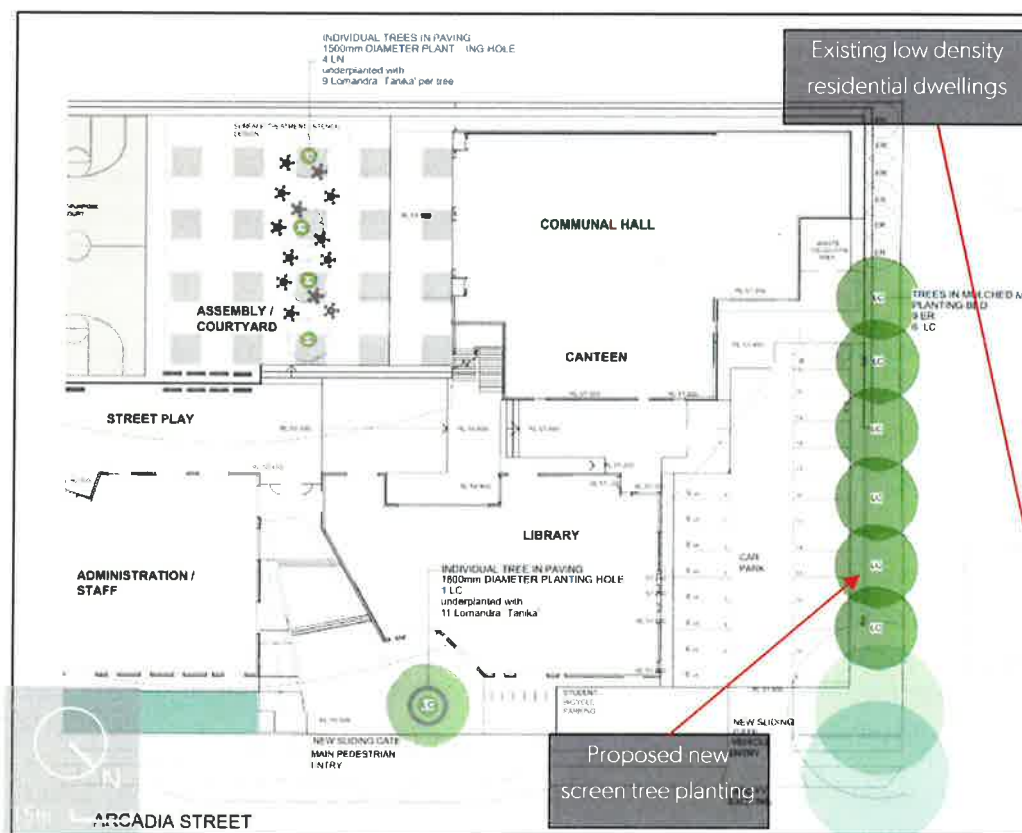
| Proposed landscape scheme – northern end of site (Source: Applicant's RtS 2018).
